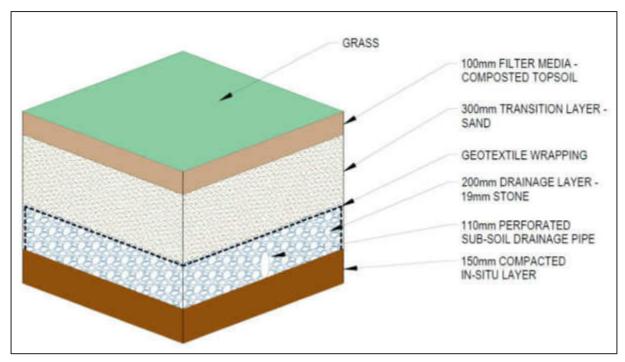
Typical Dry Attenuation Pond Engineered Layerworks
